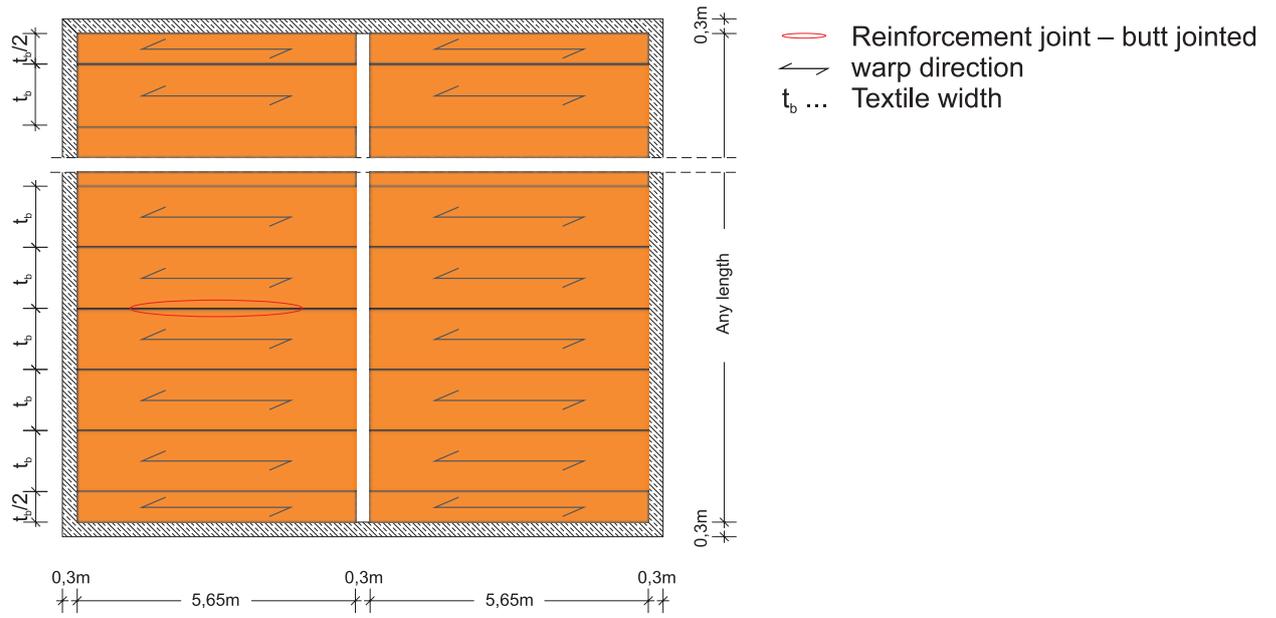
Section U-U, bottom view of ceiling slab showing installation plan for strengthening layer 2
